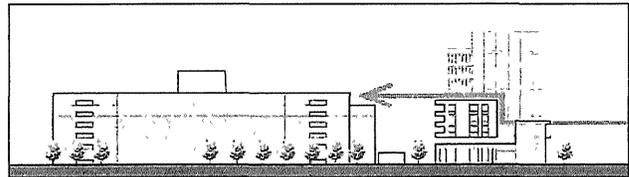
Storey Apartment Building and 65 Port Street – applicant's rendering
